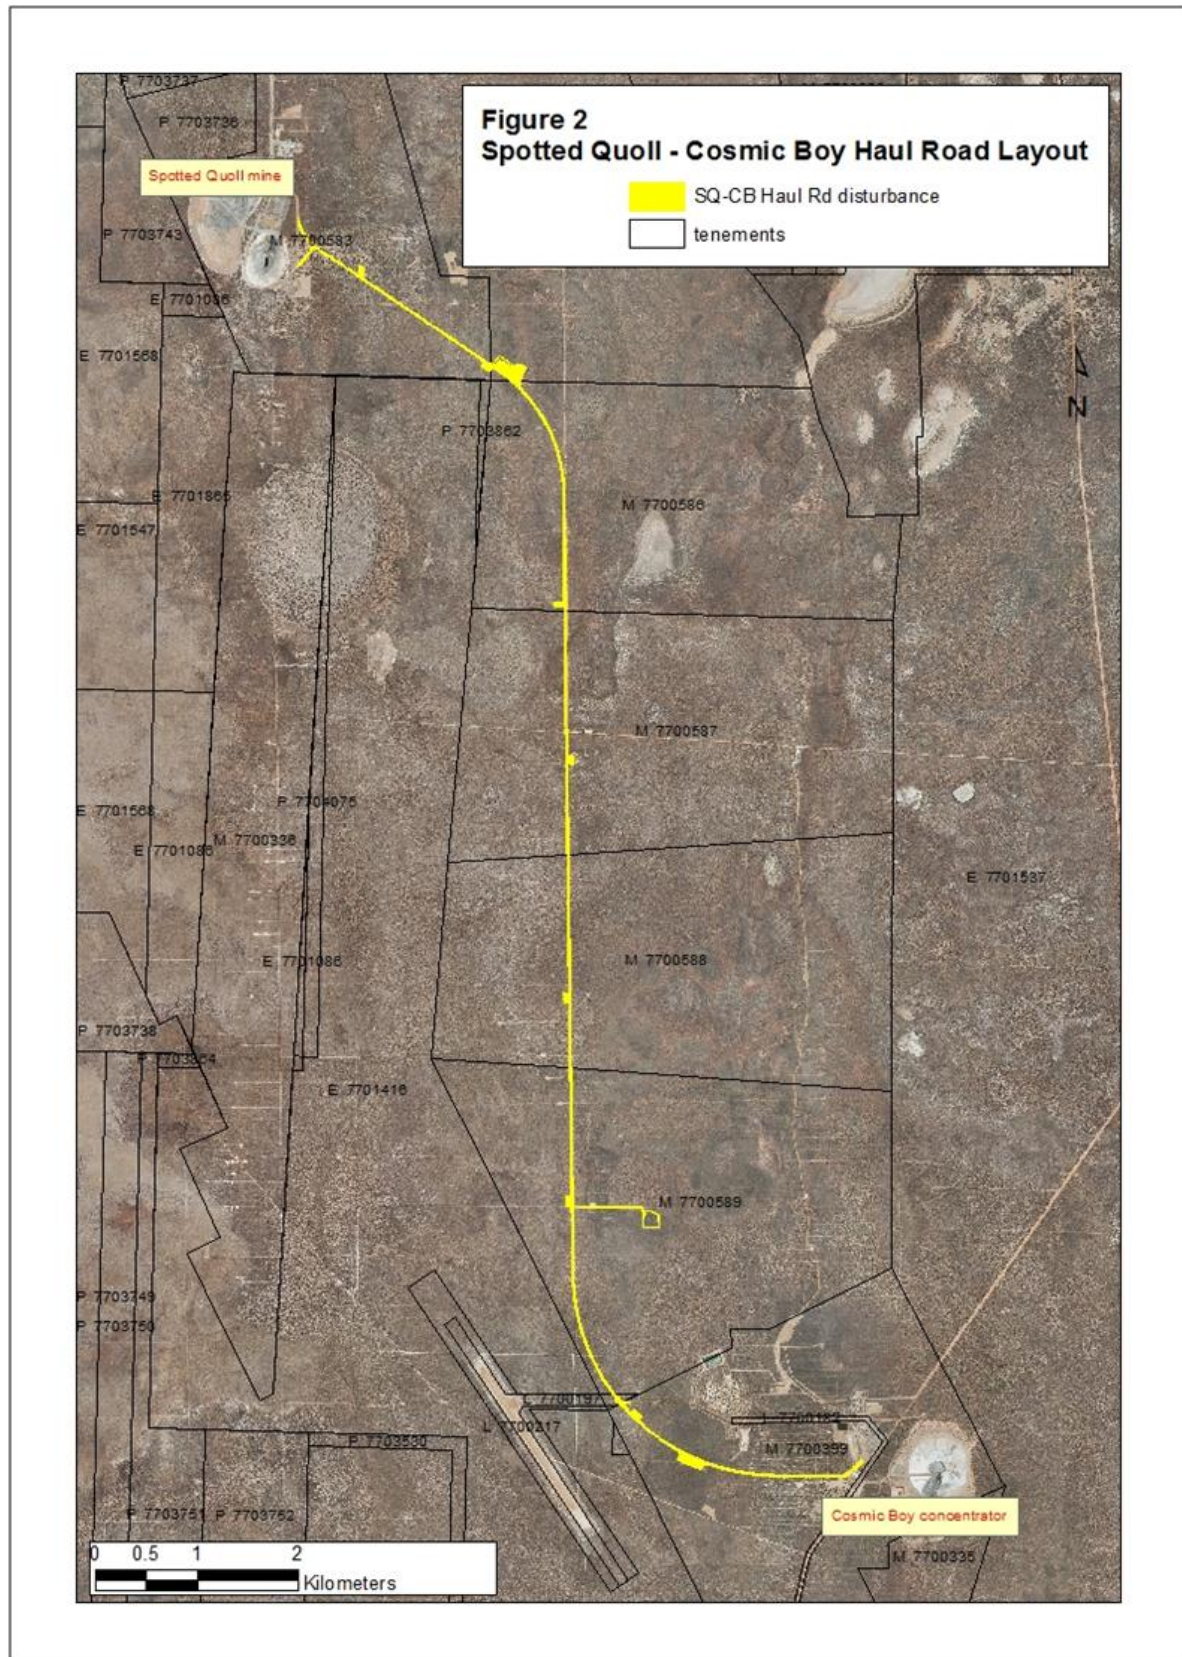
Spotted Quoll - Cosmic Boy Haul Road Proposal General Site Layout Plan
